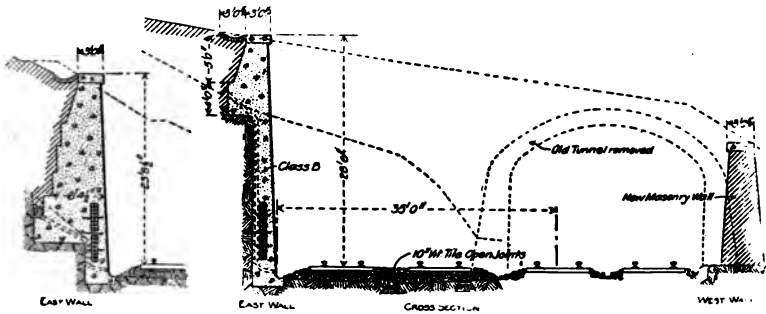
Section of Ossining Improvement, Showing Retaining Wall Work. The tops of the columns are connected by two longitudinal 24-in. I-beams encased in concrete. These beams support 20 and 24-in. I-beams spaced about 4 ft. on centers. Jack arches of concrete are sprung between these transverse beams forming the roof of the tunnel. The concrete has a minimum thickness of 6 ins. This arch construction is stiffened by a series of ribs about 12 ins. wide the full depth of the cover, and spaced about 4 ft. 6 ins. on centers.
